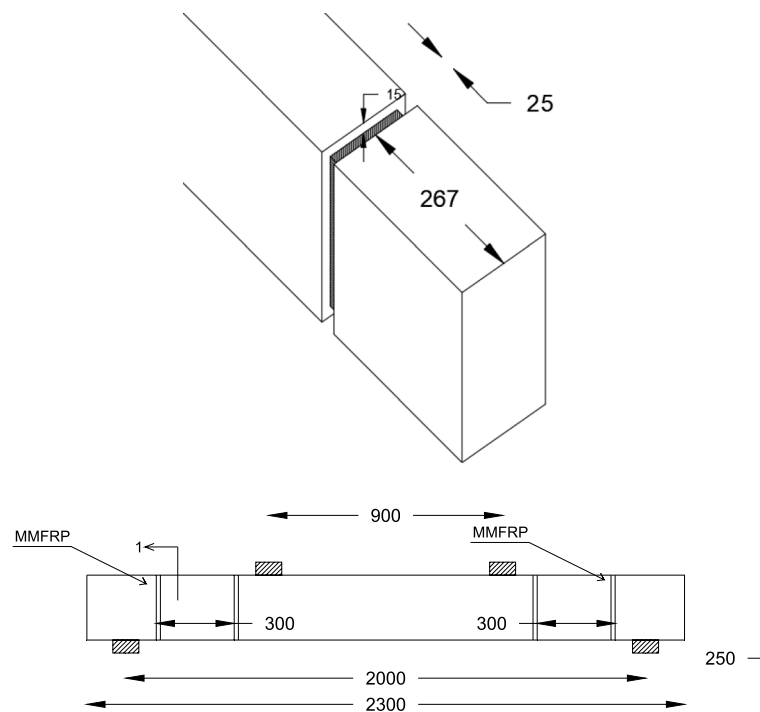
Illustration drawing to show the NSM strengthening technique (dimensions are in mm)
